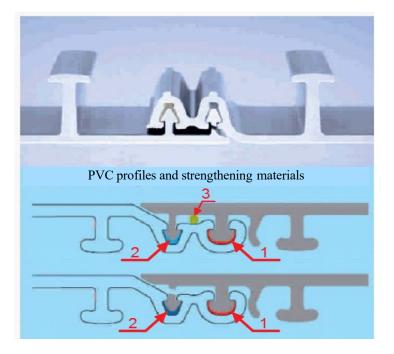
Type of typical elements and their connections by means of thermal welding: 1 — lubricating sealant; 2 — glue; 3 — cutting thread 1.3. Spiral wound technology *Danby, SPR SL. Danby* system is a pipeline rehabilitation system that allows humans to pass through it. The technology is the most optimal and cost-effective for the restoration of large diameter culverts, culverts and irregularly shaped sewer pipelines. The technology was developed in Australia in 1984 and has been uccessfully applied in North and South America, Europe, Asia and Japan. *SPR SL* technology uses an interconnected PVC profile with a steel core to form the casing (Fig. 4).
